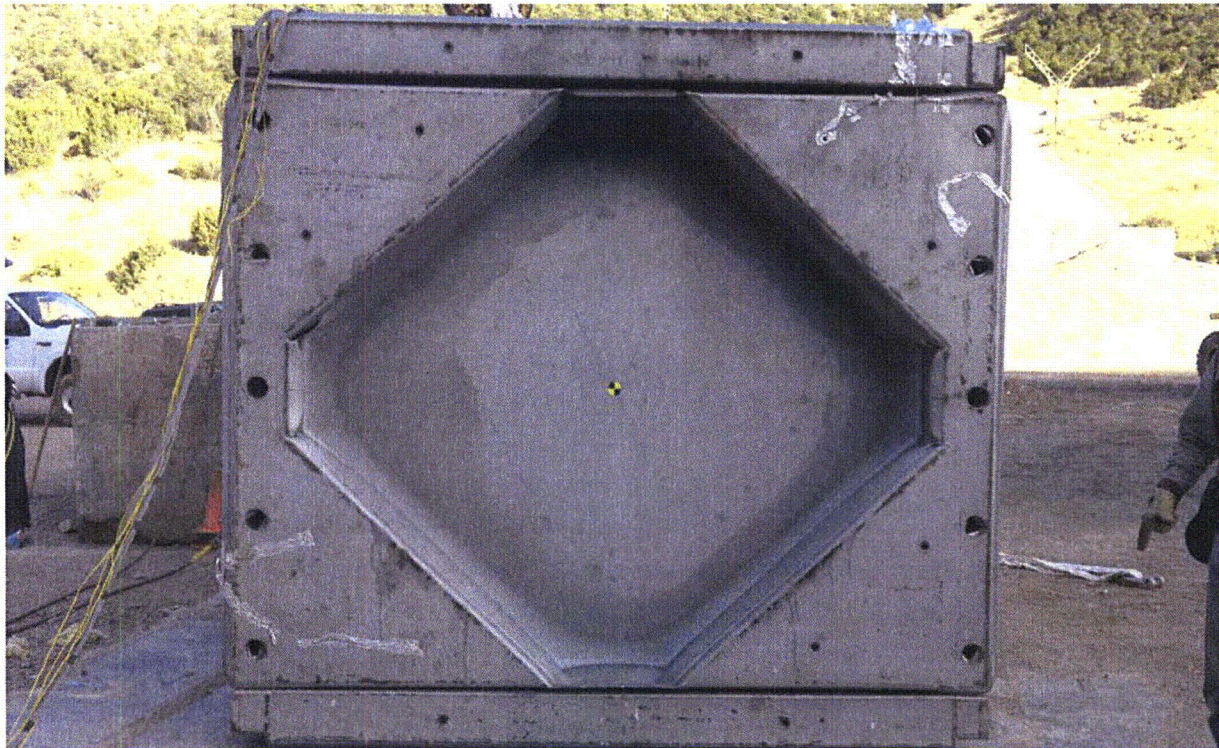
Test LD2, Overall View of Impact Surface
